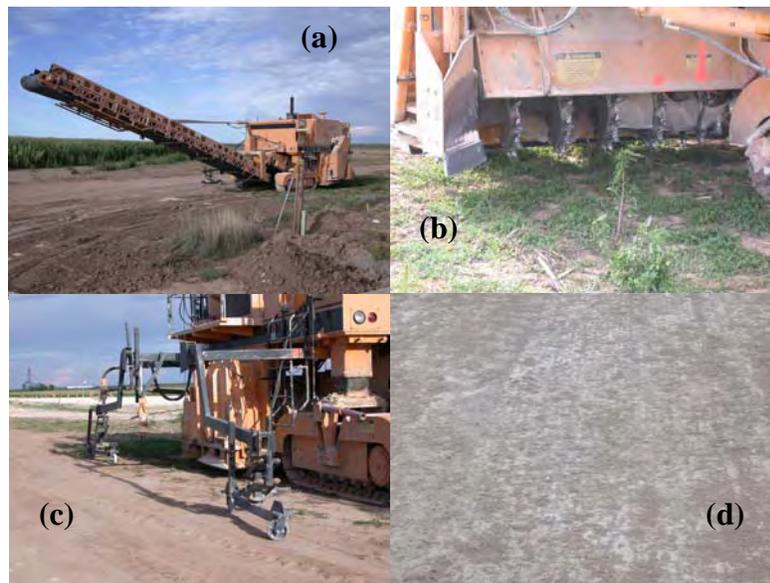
Trimming Machine Used in Base Finishing (a) Machine with Excess Material Loading Conveyor (b) Cutting Blades, (c) Guide Roller Assembly and (d) Finished Base Surface After Rolling
